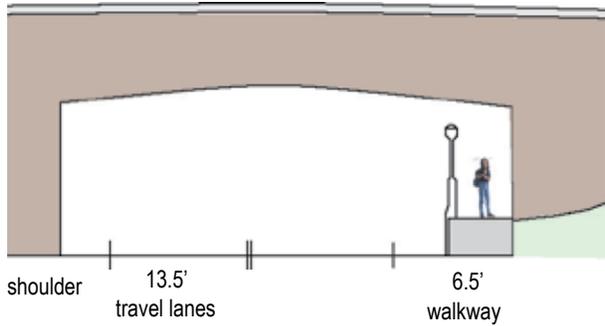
Church Road underpass proposed raised walkway cross-section looking east
